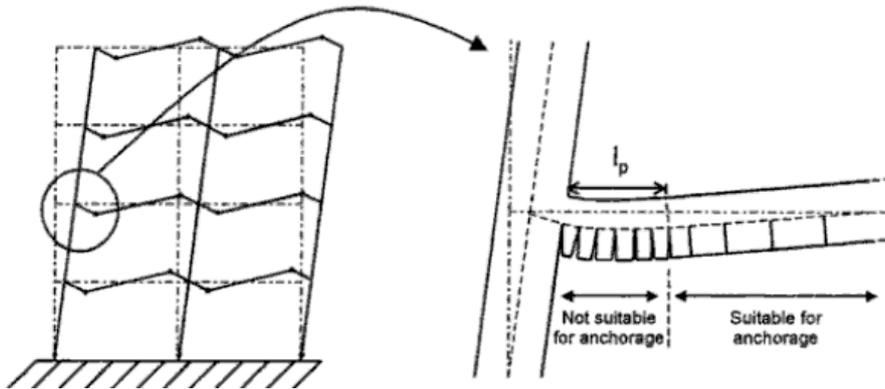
Member cracking, assuming a strong column, weak girder design
